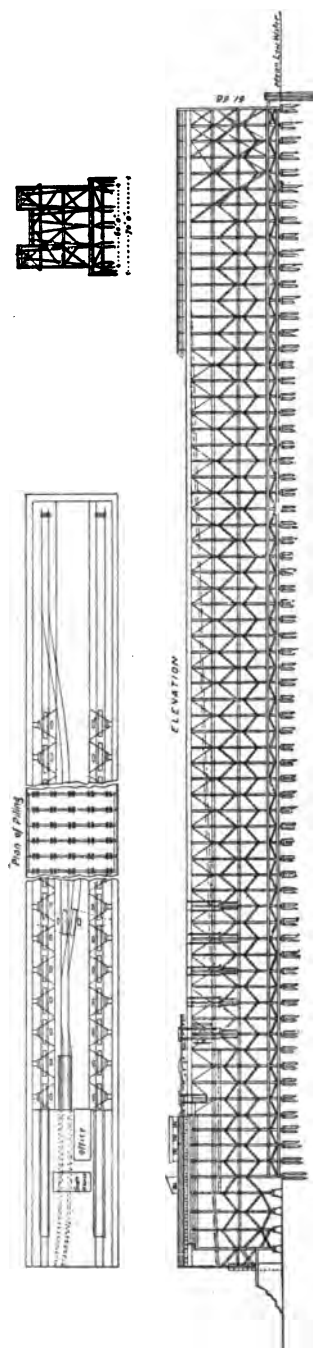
Plan and Elevation of B. & O. Coal Pier at Curtis Bay, Md.
